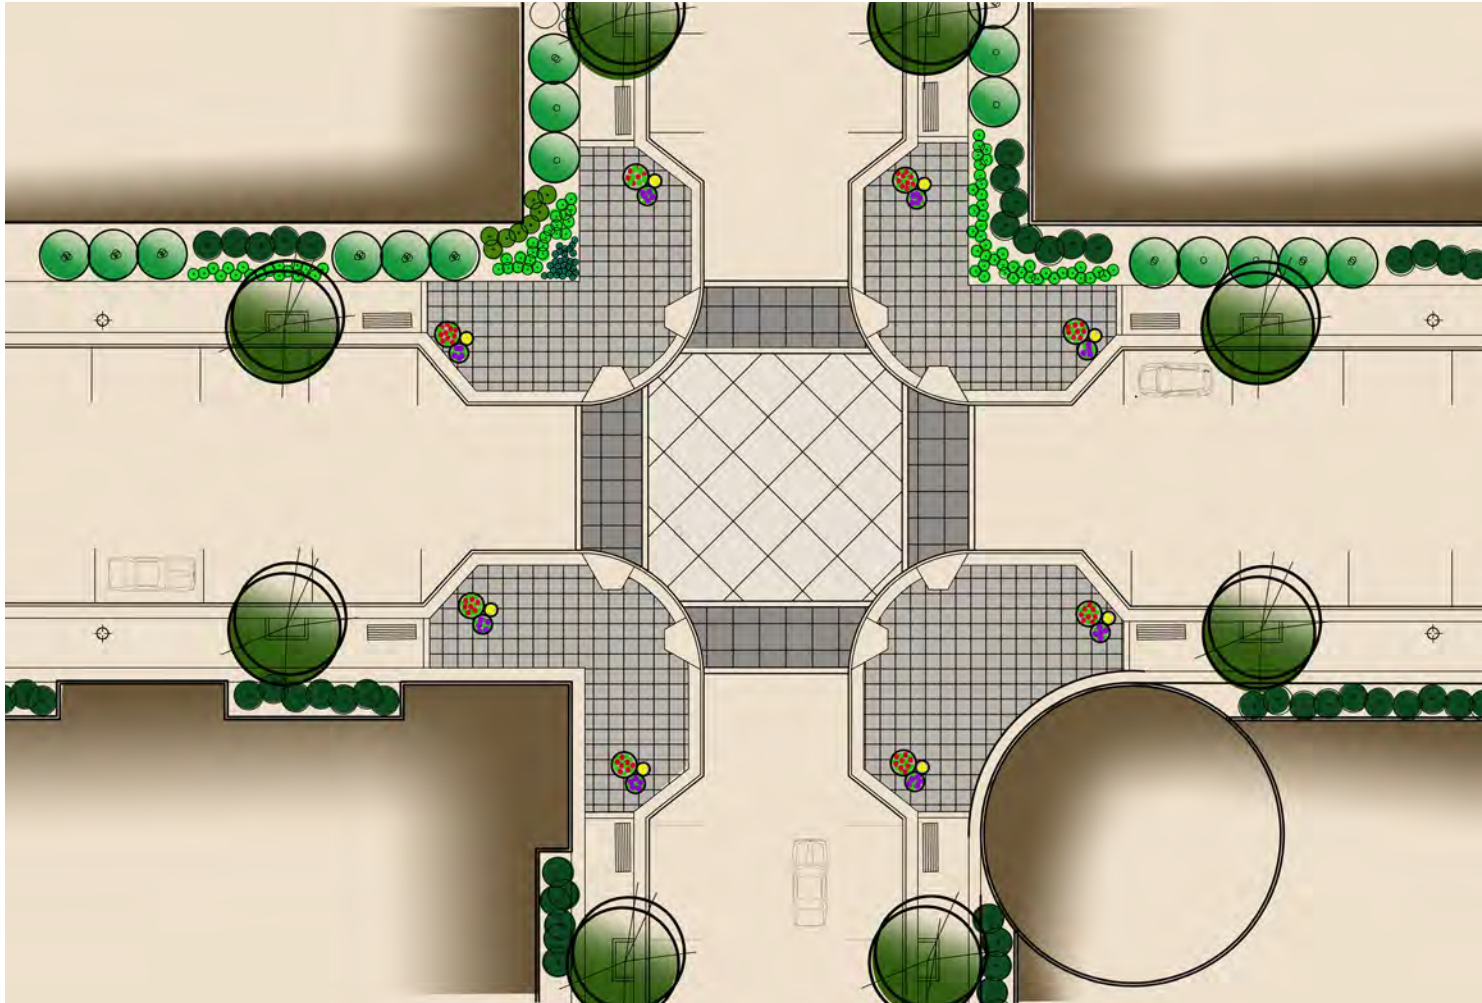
Curb bump out of Hickory Avenue and Campbell Street
